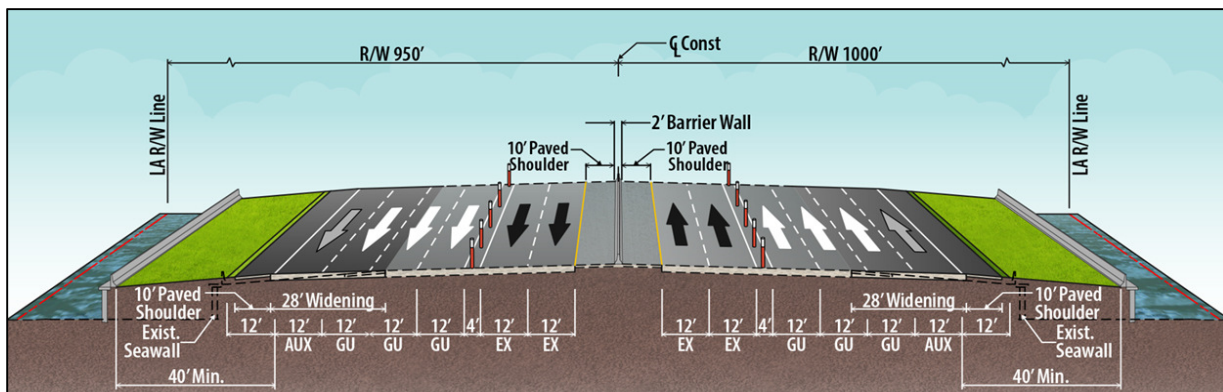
I-275 Mainline Master Plan Build Alternative Typical Section from Roosevelt Boulevard to south of 9th Street North (Segment C-MP2)
